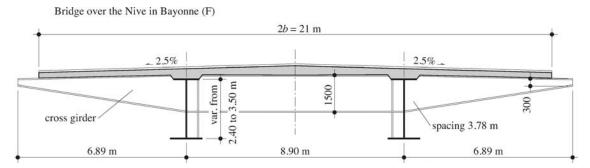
Example of the cross section of a composite bridge with cross girders and cantilever girders [8.1].
